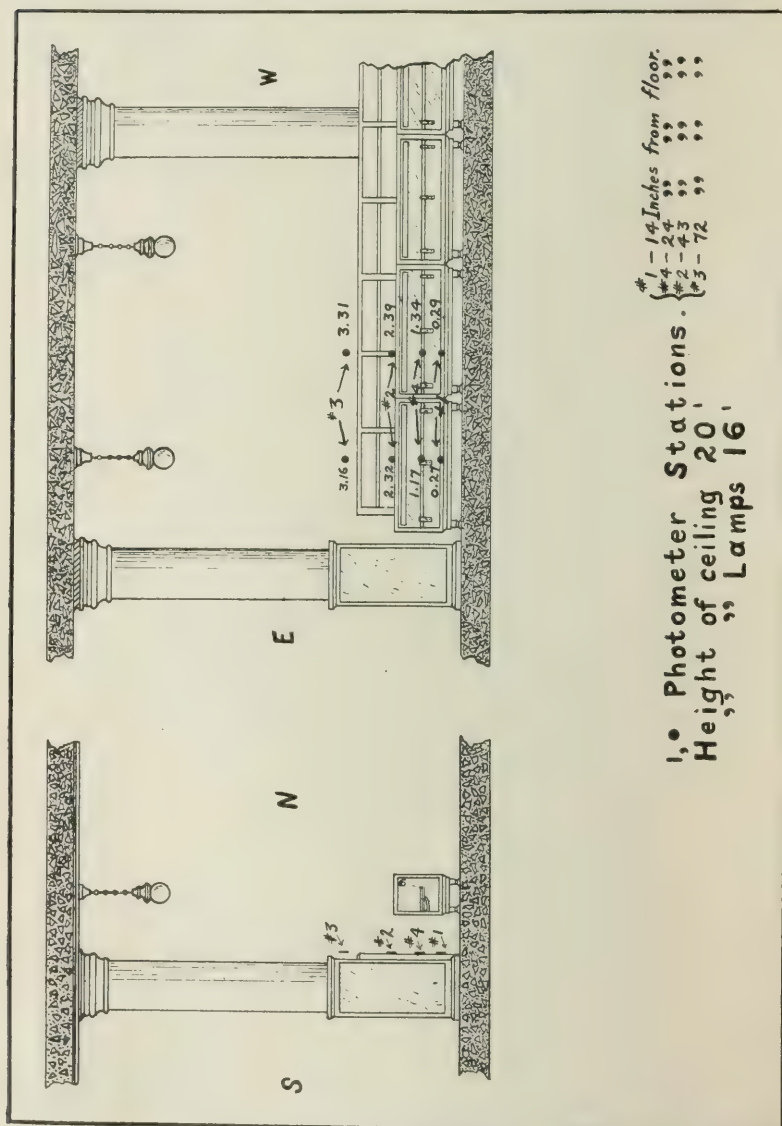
Section plan of main floor, (gentlemen's neckwear), showing location of furniture, pillars, lighting units, test stations and illumination data.
